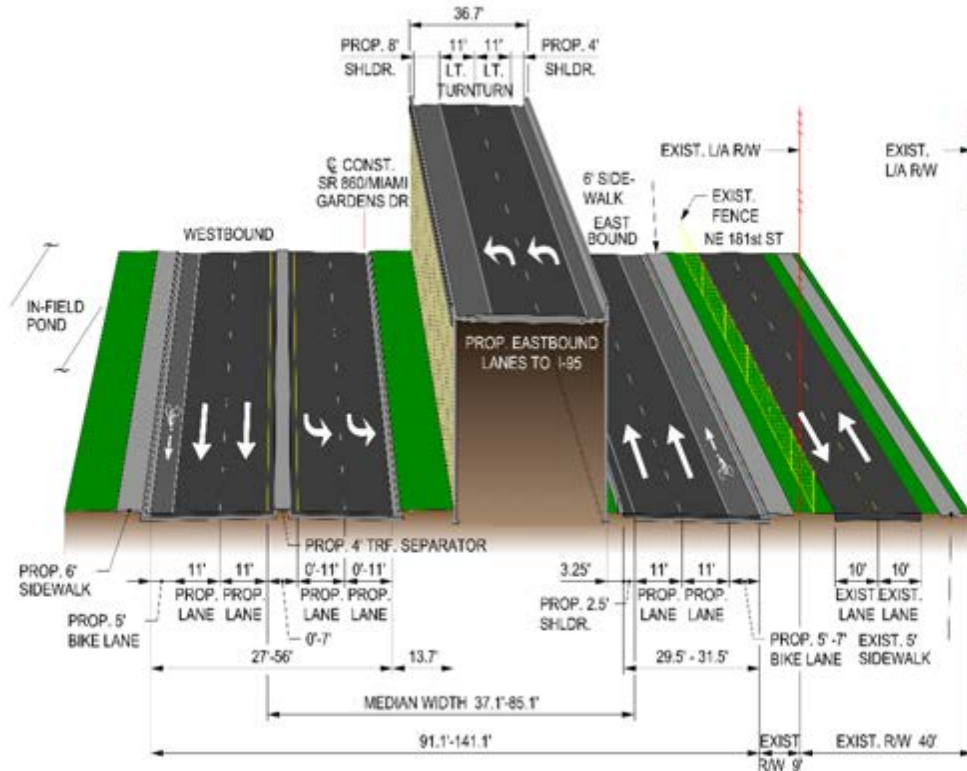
8: Proposed Typical Section - Alternative 2 – SR 860/Miami Gardens Drive
